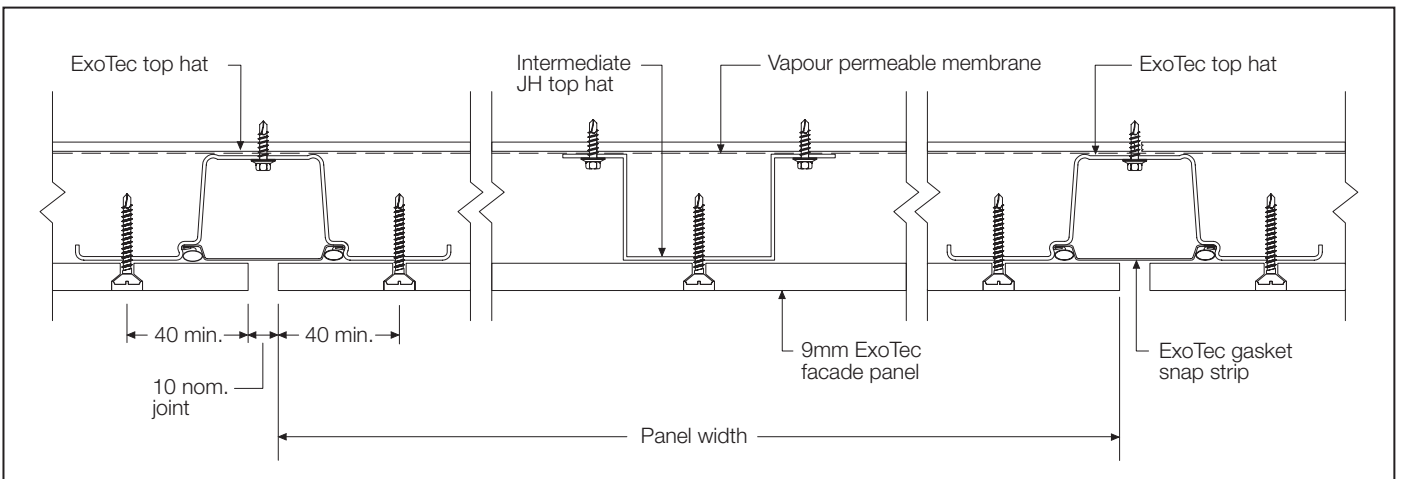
TOP HAT AND PANEL FIXING DETAIL
